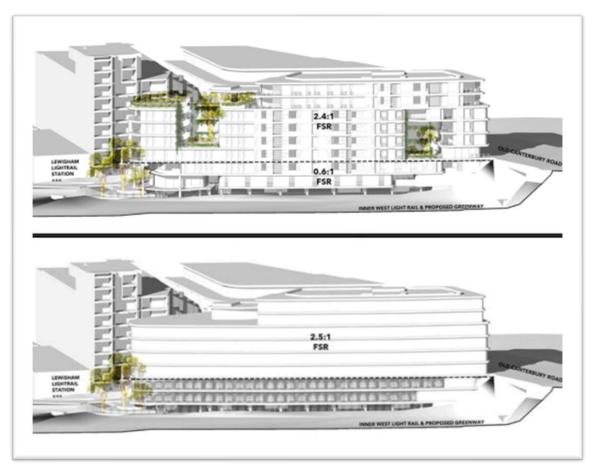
Model of built form envelope approved under planning proposal (bottom image) & – Model of built form envelope proposed under current development application (top image)
